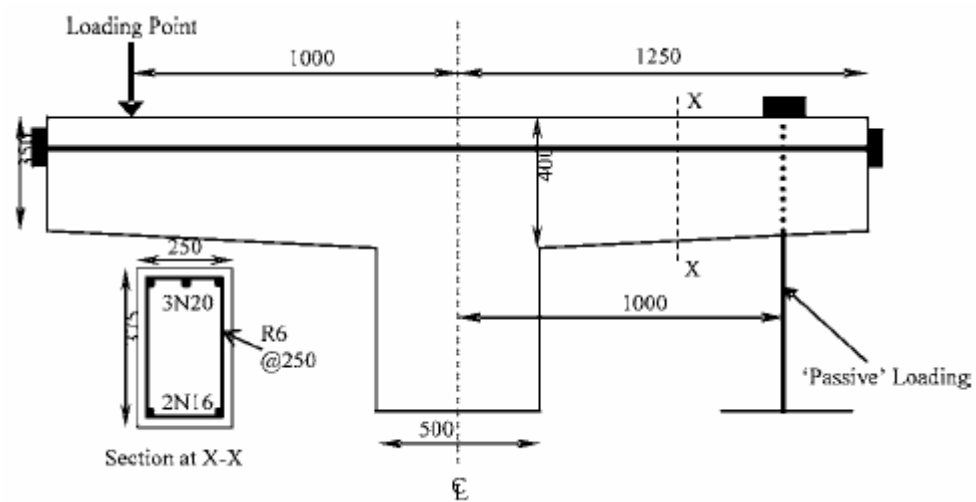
Deep beam specimen 1 details taken from Aravinthan and Suntharavadiel
